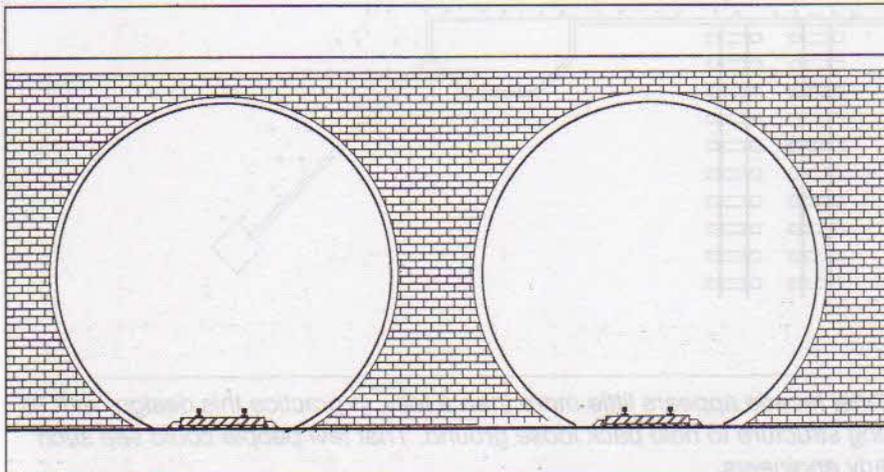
/40 Circular tunnels are extremely rare, other than on the London tube network. However, recent tunnelling techniques, using rock-boring machines, have led to more circular bores being built, while some tunnels under motorway embankments have been made from concrete or steel tubes. Diesel and electric traction has made the tight-fitting circular bore less troublesome.
